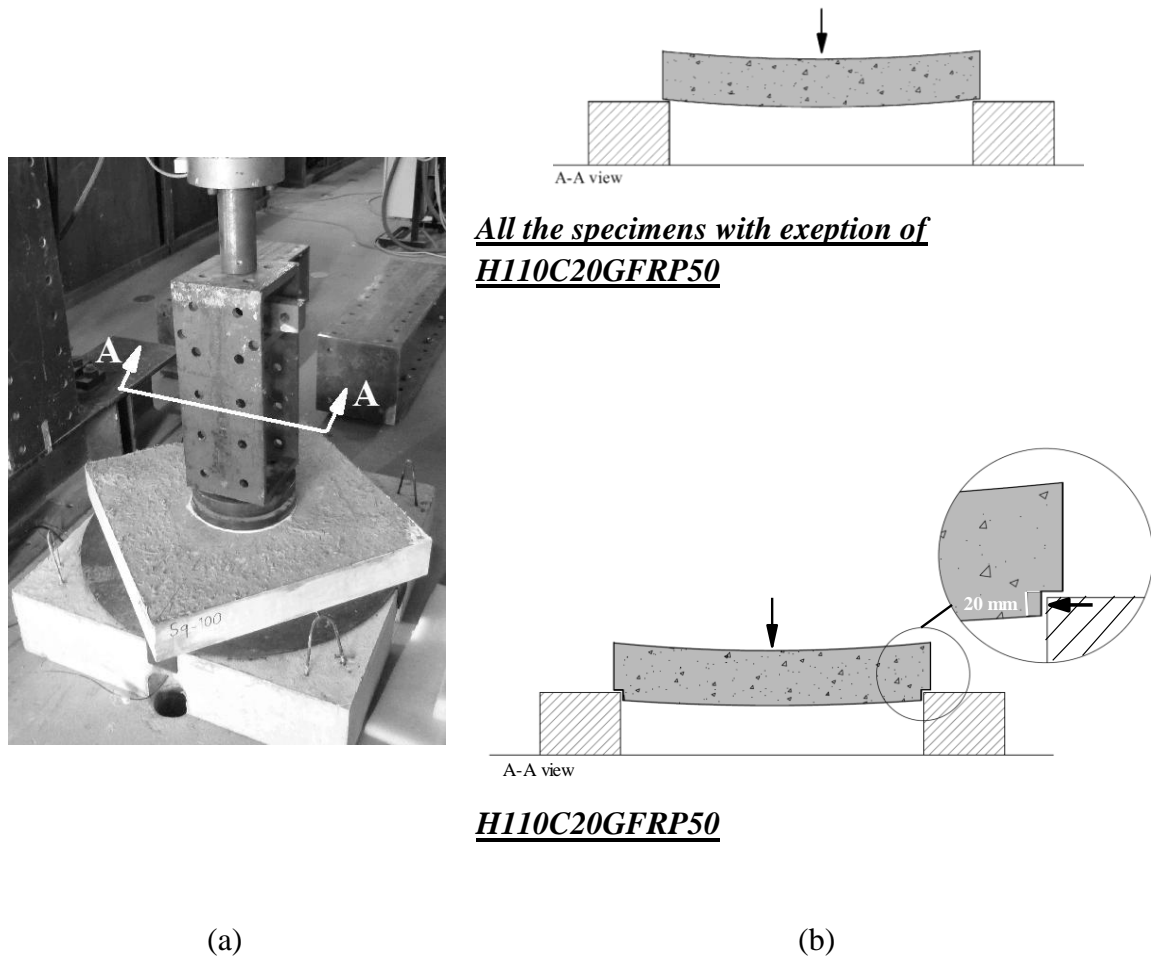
(a) HPFRC manhole covers configuration and test arrangements; and (b) specimens layout and reinforcement arrangement (A-A view).
